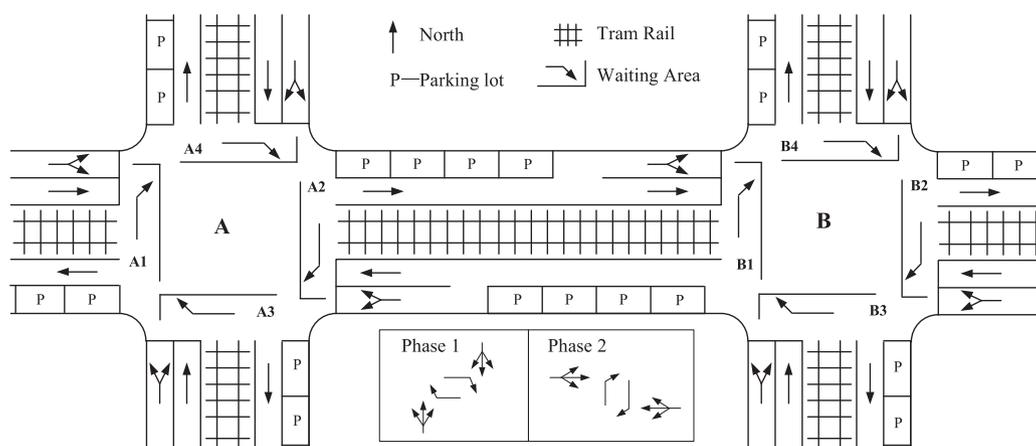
The typical geometry and phasing plan for hook-turn intersections in Melbourne.
